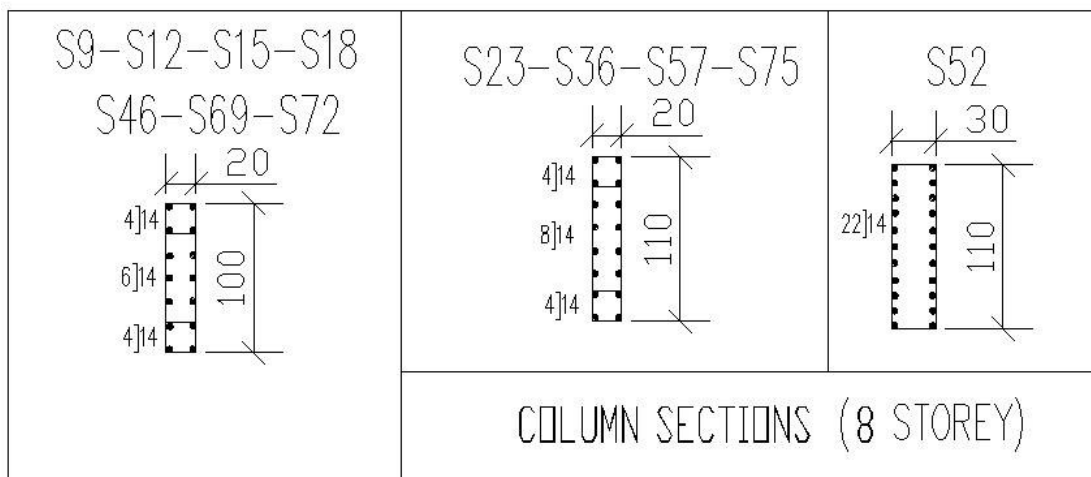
Column sections (column dimensions in cm; reinforcement in mm).
